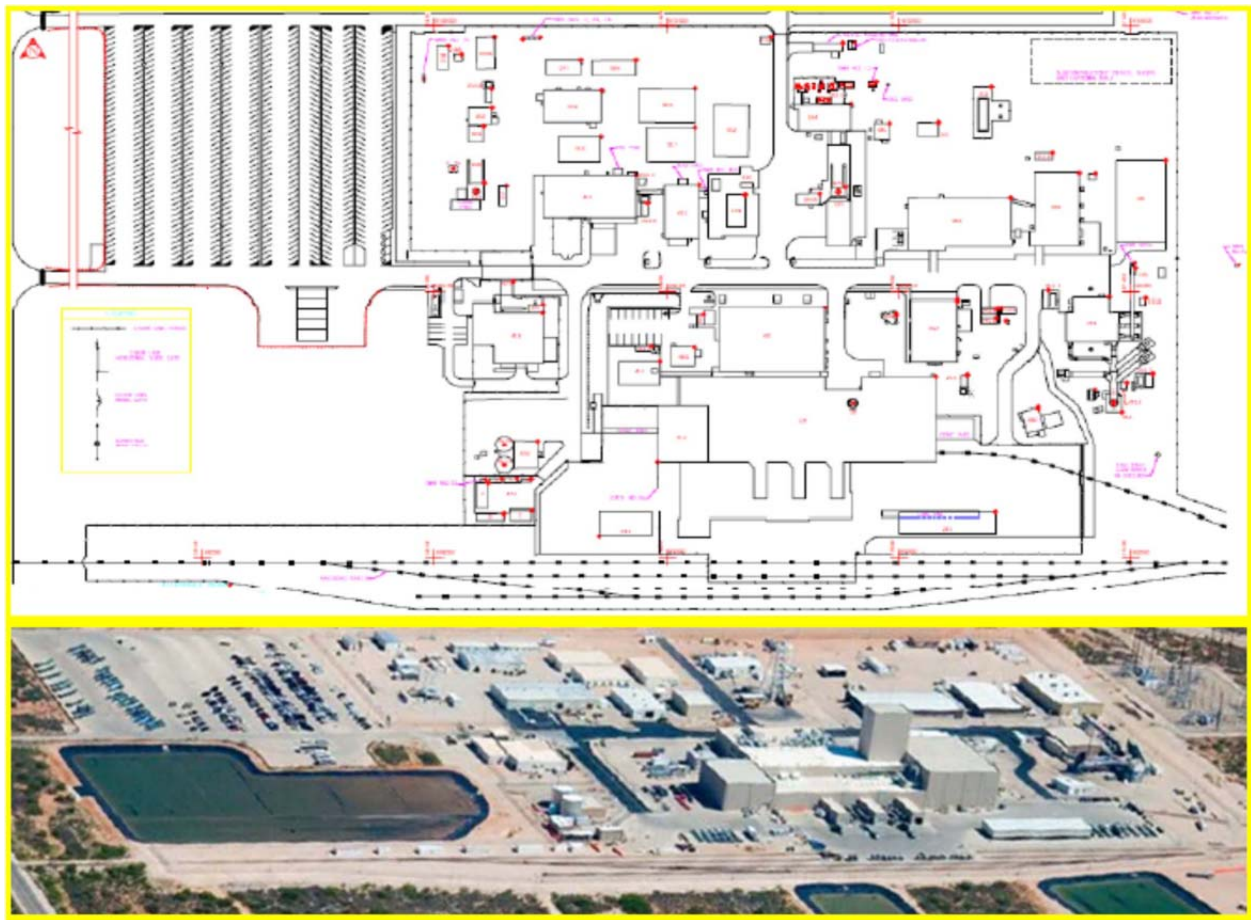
WIPP Facility Structures Plot Plan And Aerial View
